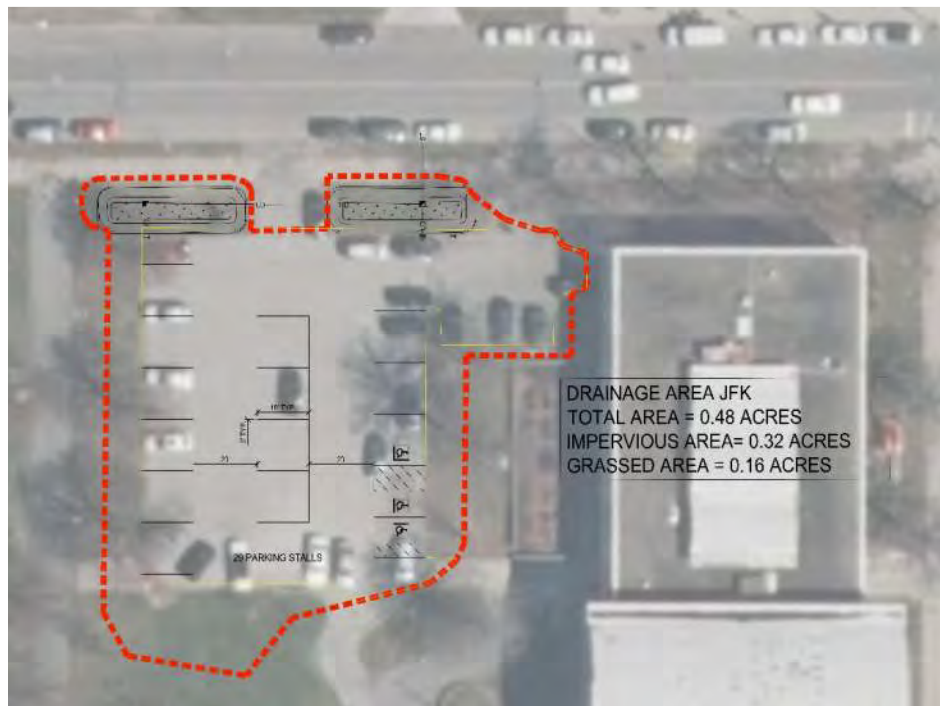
Plan View of the JFK Community Center and Drainage Area
